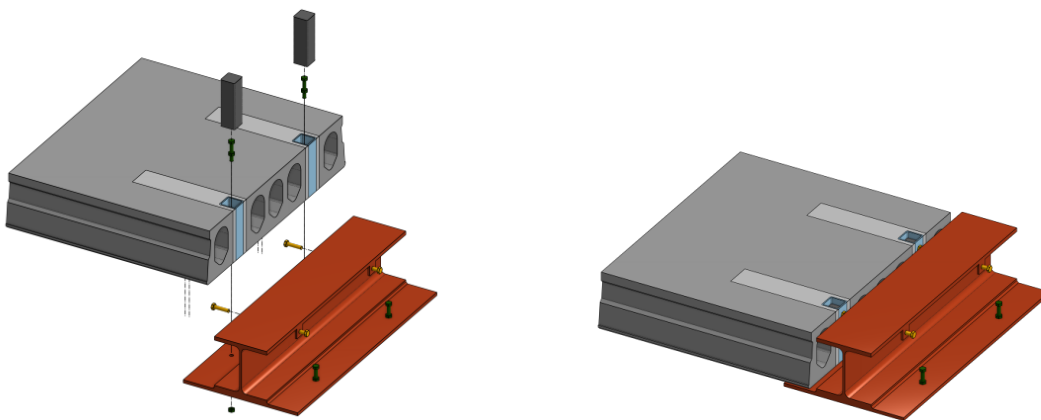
Application of demountable bolted shear connector in hollow core slabs, integrated with the steel I-section [62]
